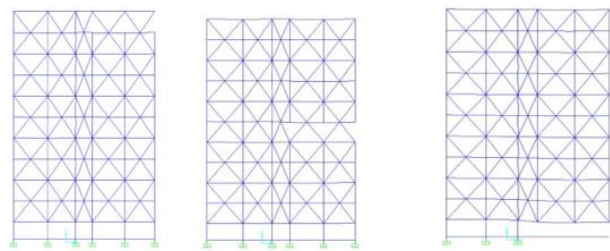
Diagrid system Column Removal Scenarios at Bottom Floor, Center Floor and Top Floor
